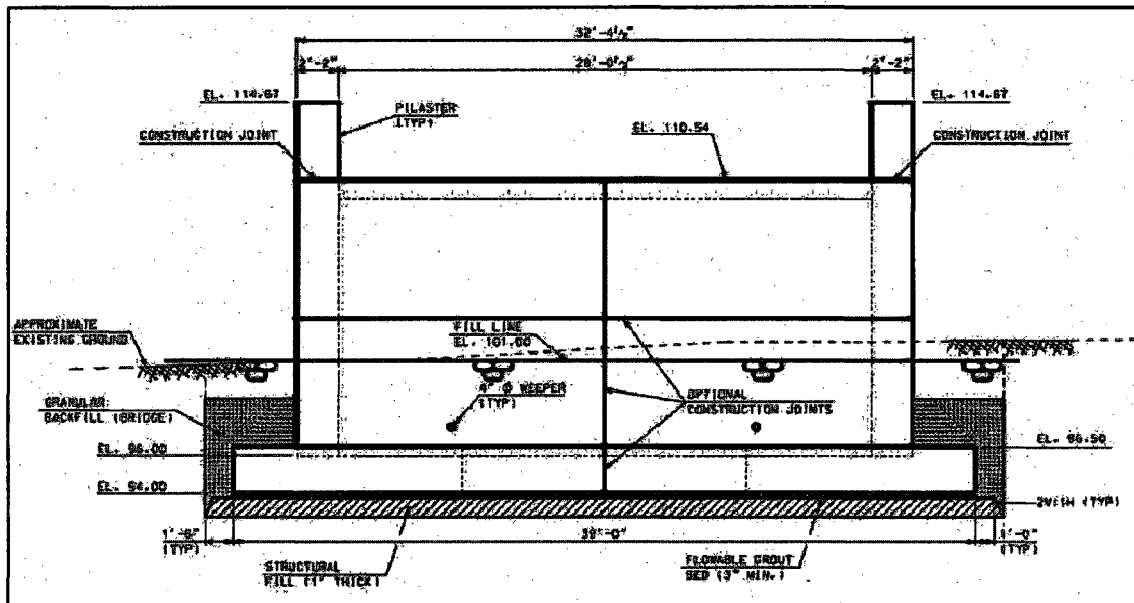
Mill Street Bridge substructure (PCI, 2005)
